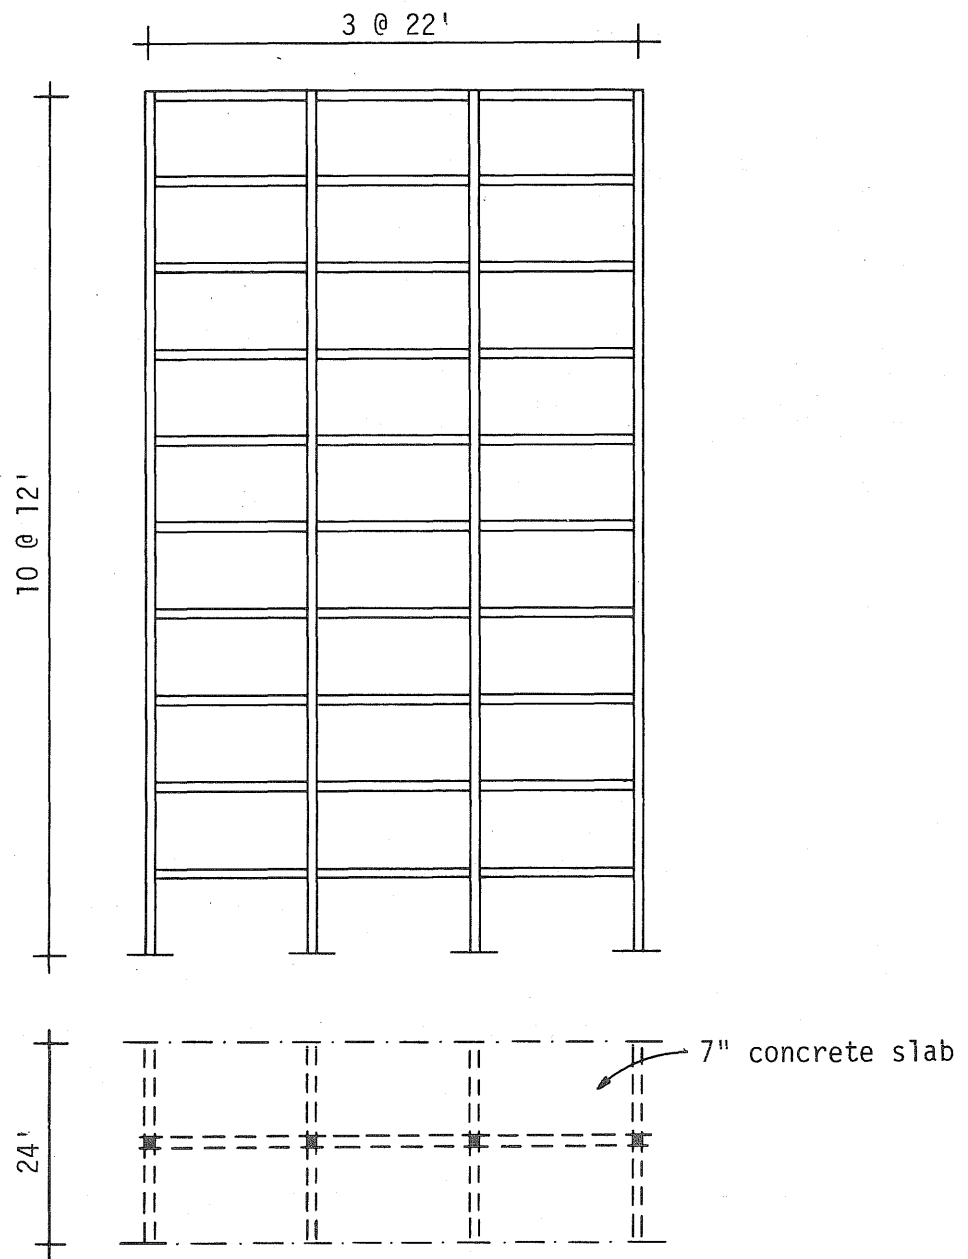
PLAN AND ELEVATION OF STRUCTURES CONSIDERED
